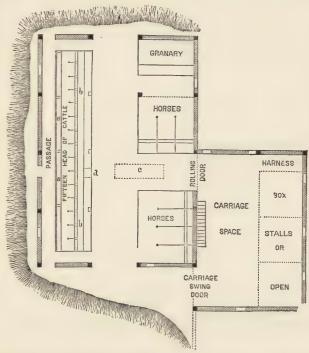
Principal Floor—Main portion, 40 by 60 feet; Wing, 30 by 40 feet; Cow Stable, 13 feet wide—Stalls, 346 feet wide; Horse Stable, 14 feet wide—Stalls, 444 feet; a a, Manure Gutter; b b, Stanchions; c, Position of Threshing Machine; d, Movable Boards to admit Band from outside.
